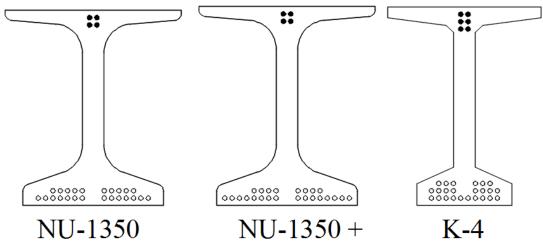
Comparison of Harped NU Girder and K-Girder System with 100-ft Span Length
